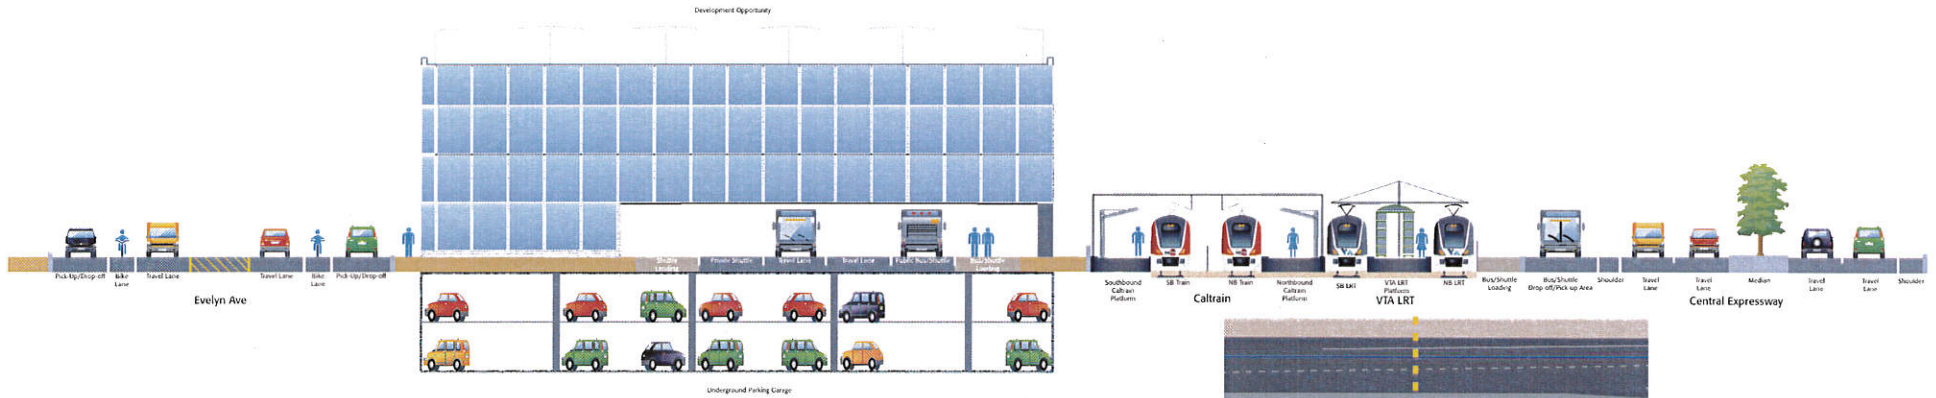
Mountain View Transit Center Master Plan Concept Cross-Section
